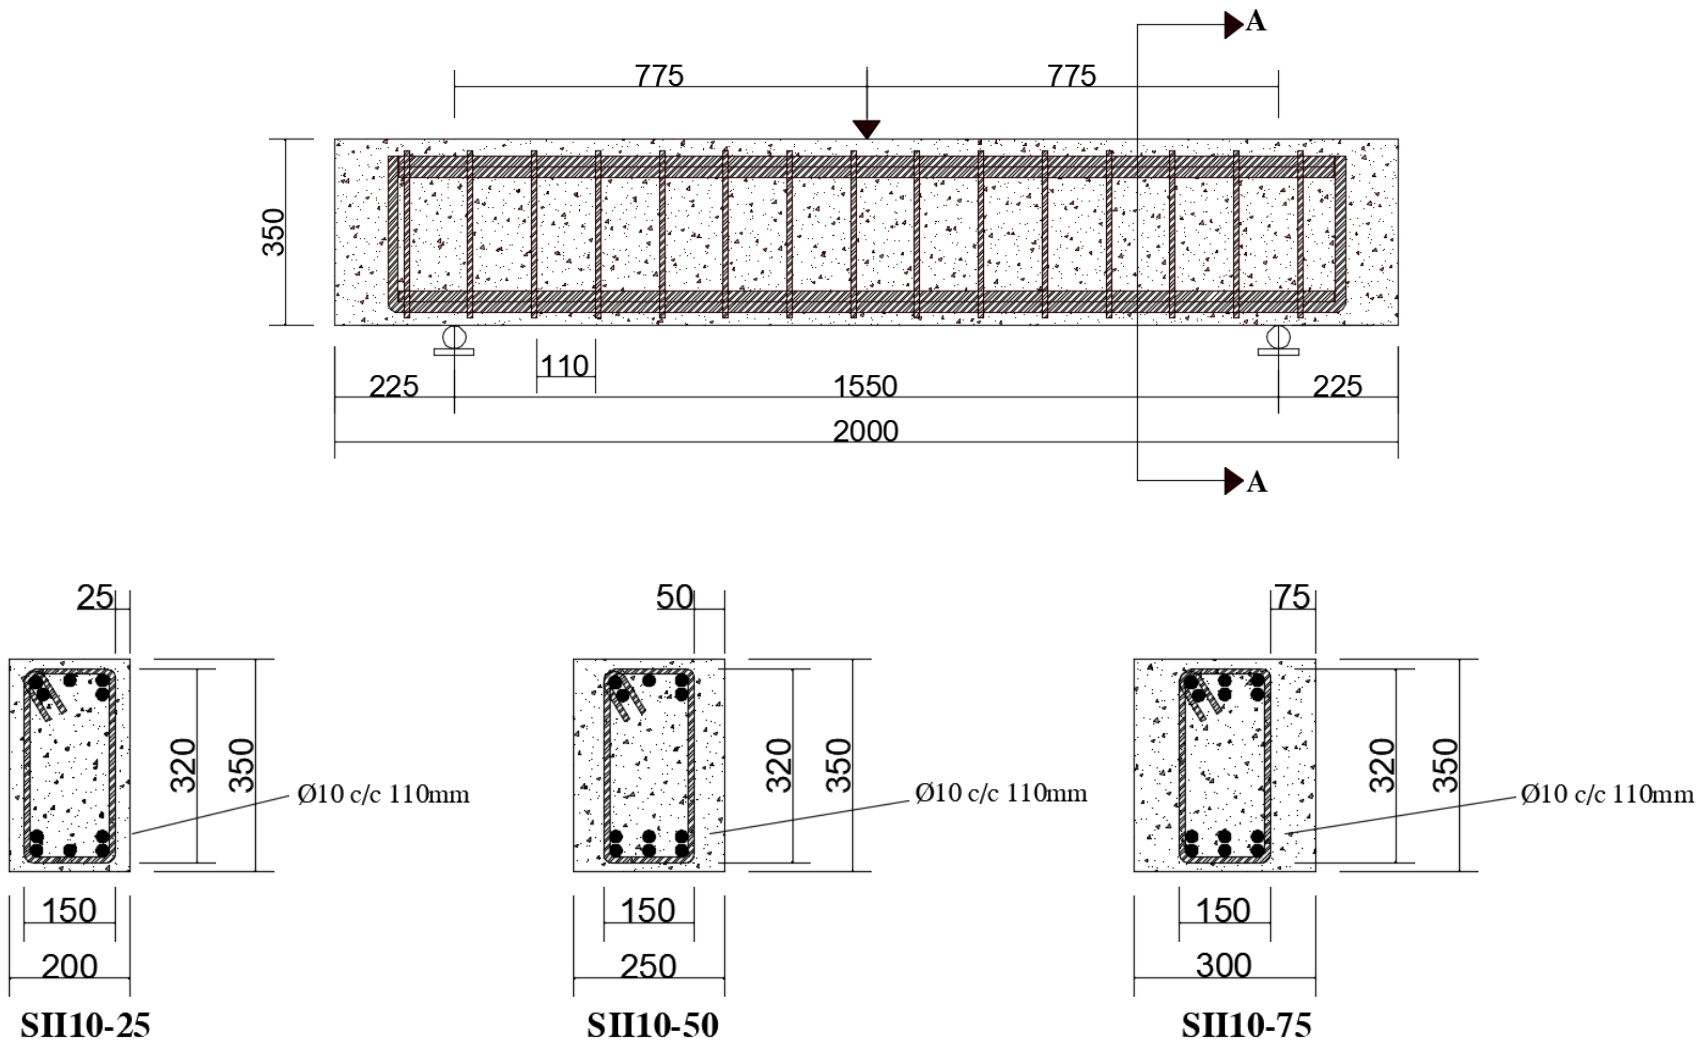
Cross Sectional Detail of Main Specimens SET II (All Dimension are in mm)
